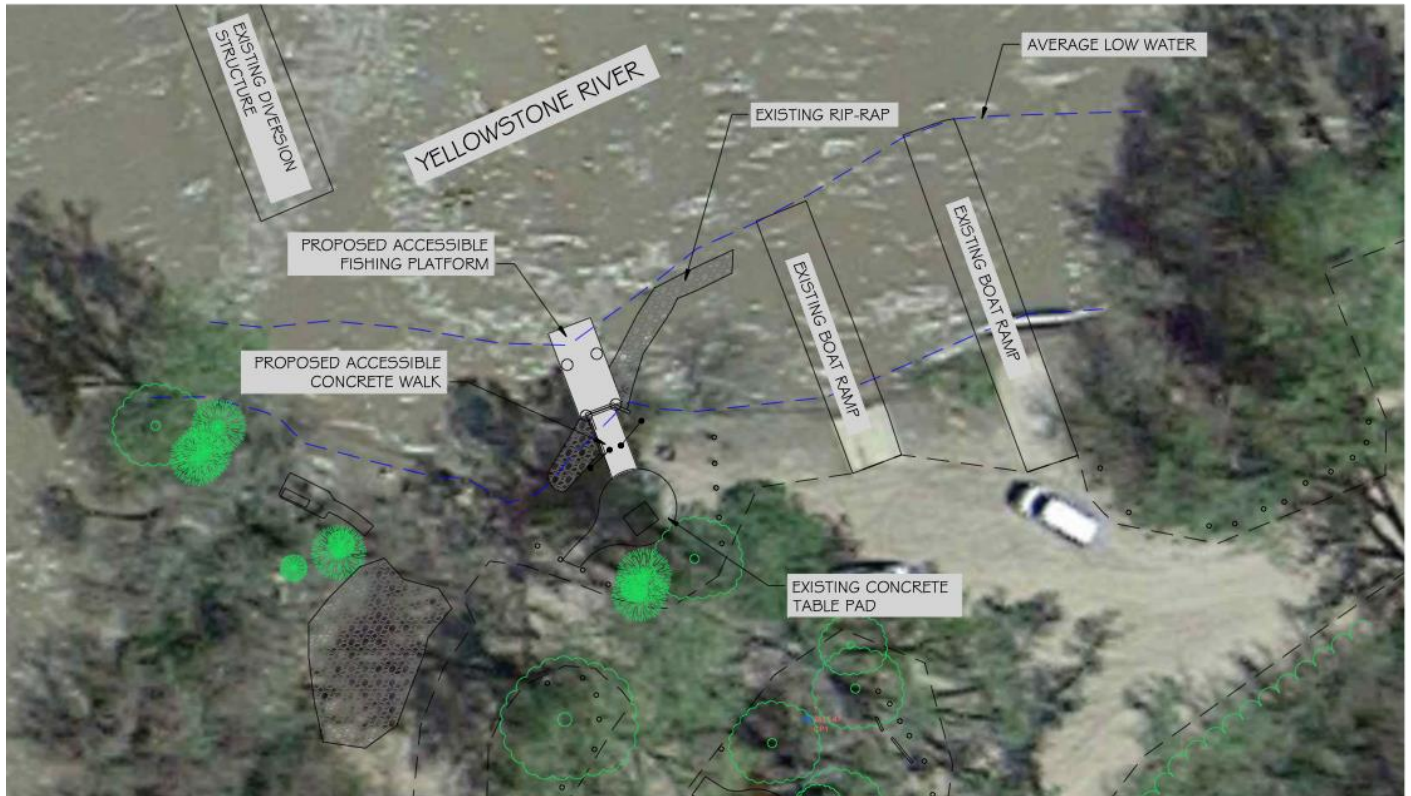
Rosebud East FAS Preliminary Concept Plan, Forsyth, Montana
